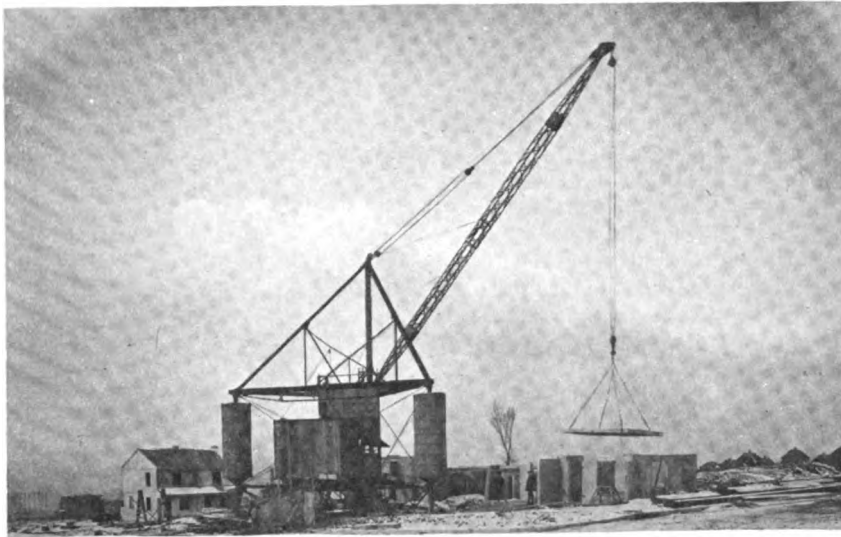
HOIST PUTTING SLABS IN PLACE IN HOUSE
